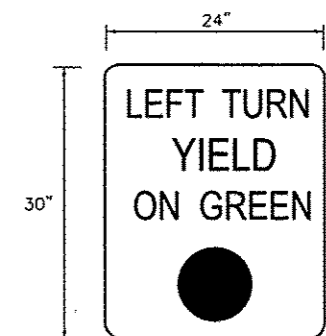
DETAIL OF SIGN PANEL - TYPE 1 ⓐ
